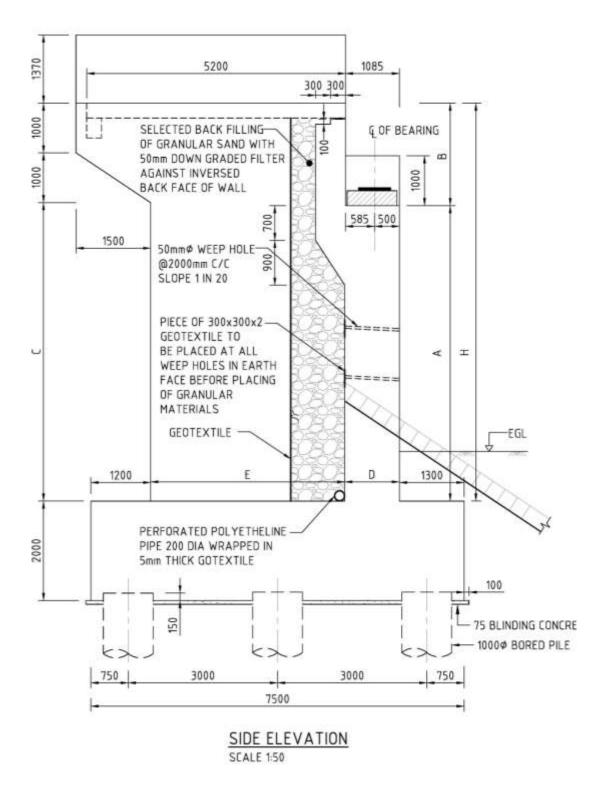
Abutment Design of the Proposed Karatoya Bridge
